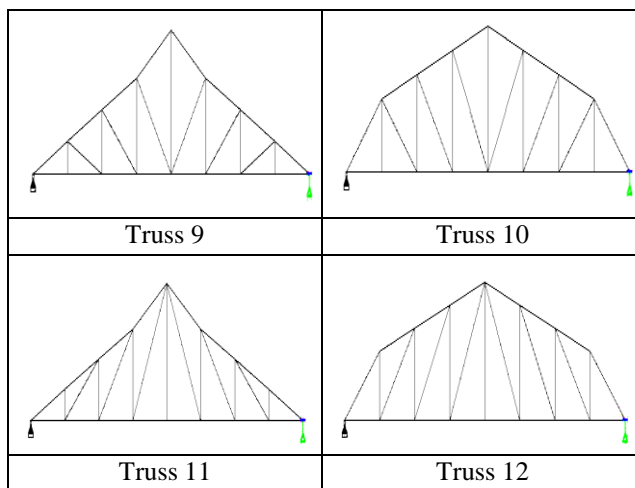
Trusses with various slopes [Truss 9 to Truss 12]
